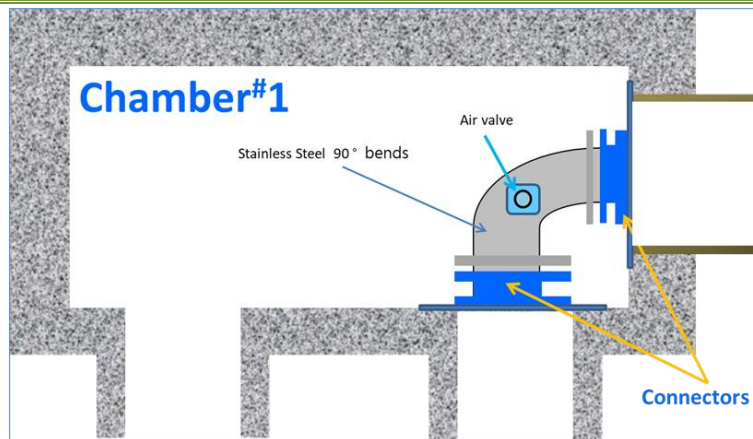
Stainless-steel tube mounted on manhole walls.
